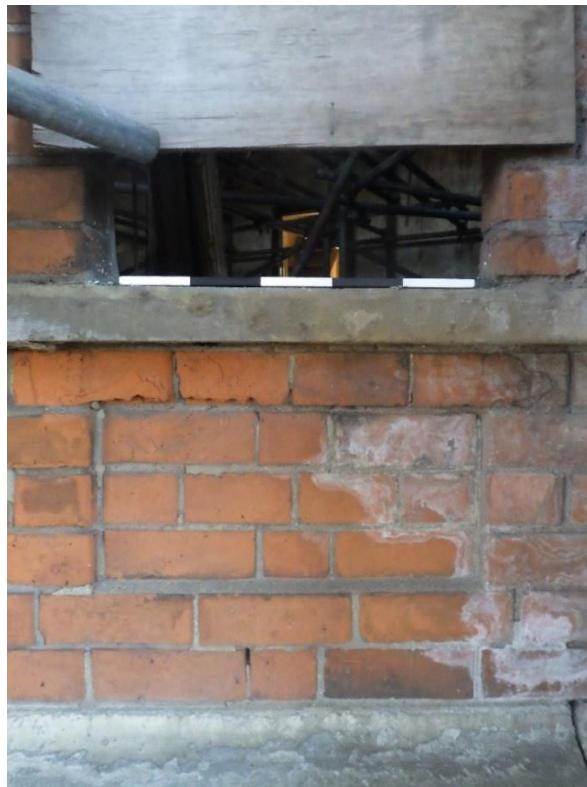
West facing sill and underlying indented brick pattern in bay window on first storey, looking east (0.50m scale).
